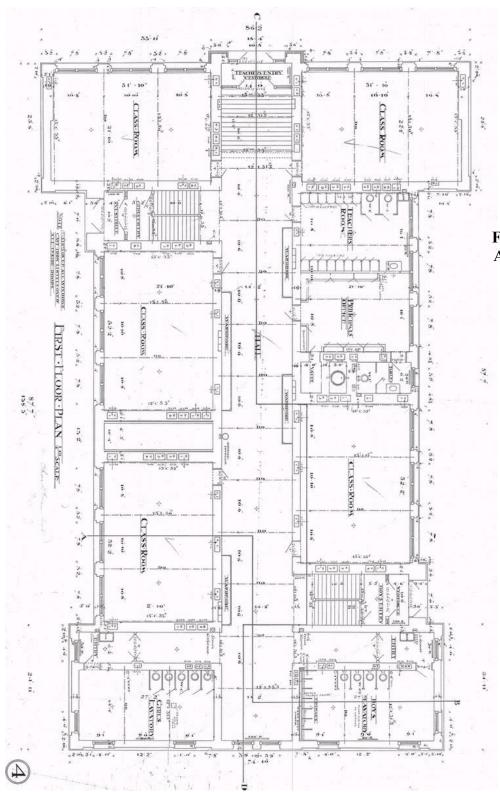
First Floor Plan Architectural Drawings for Public School 24 C.D. Swan, 1901
